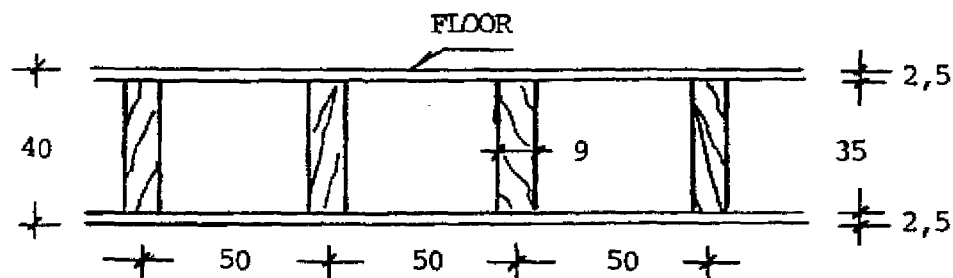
CROSS-SECTION OF THE WOODEN SLAB
